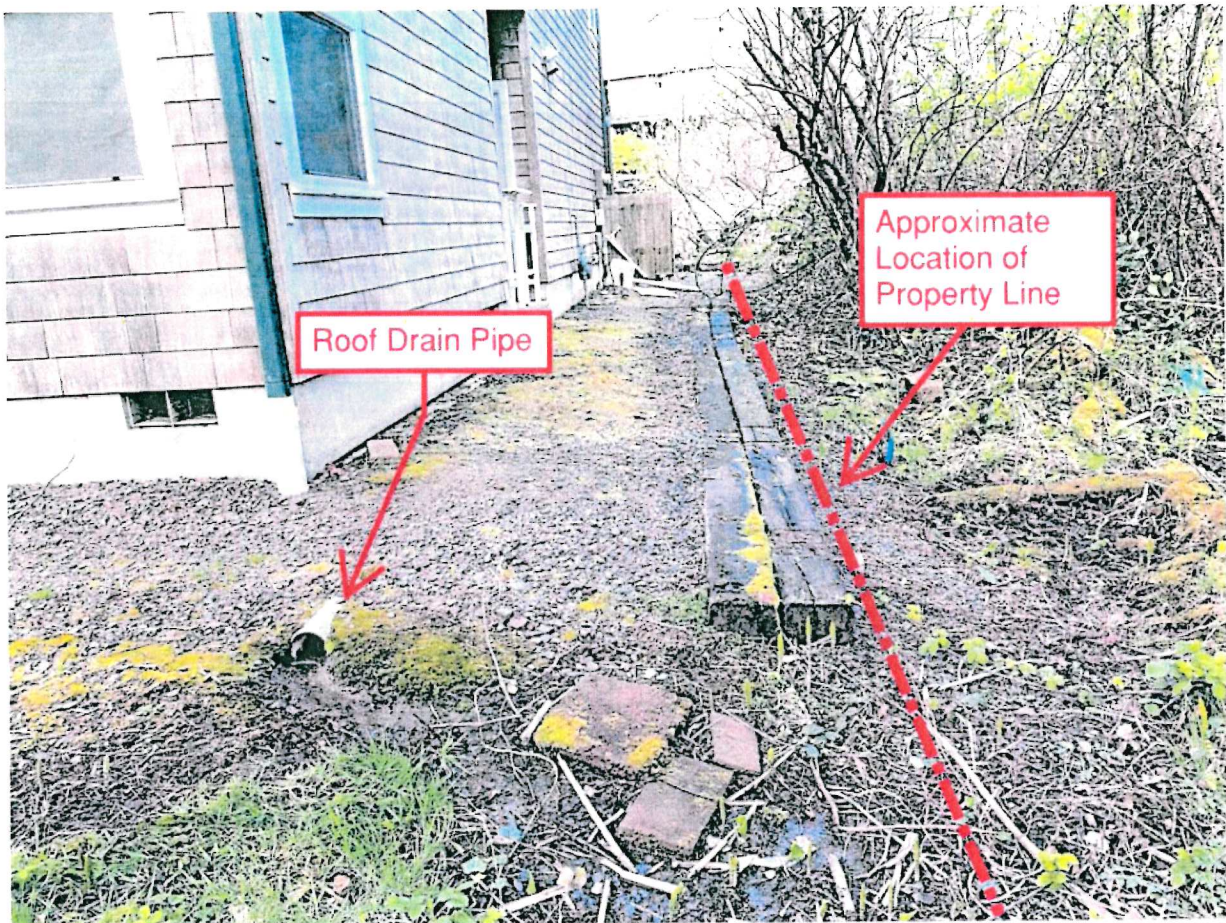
1603 Forest Lawn Road Roof Drain Pipe
